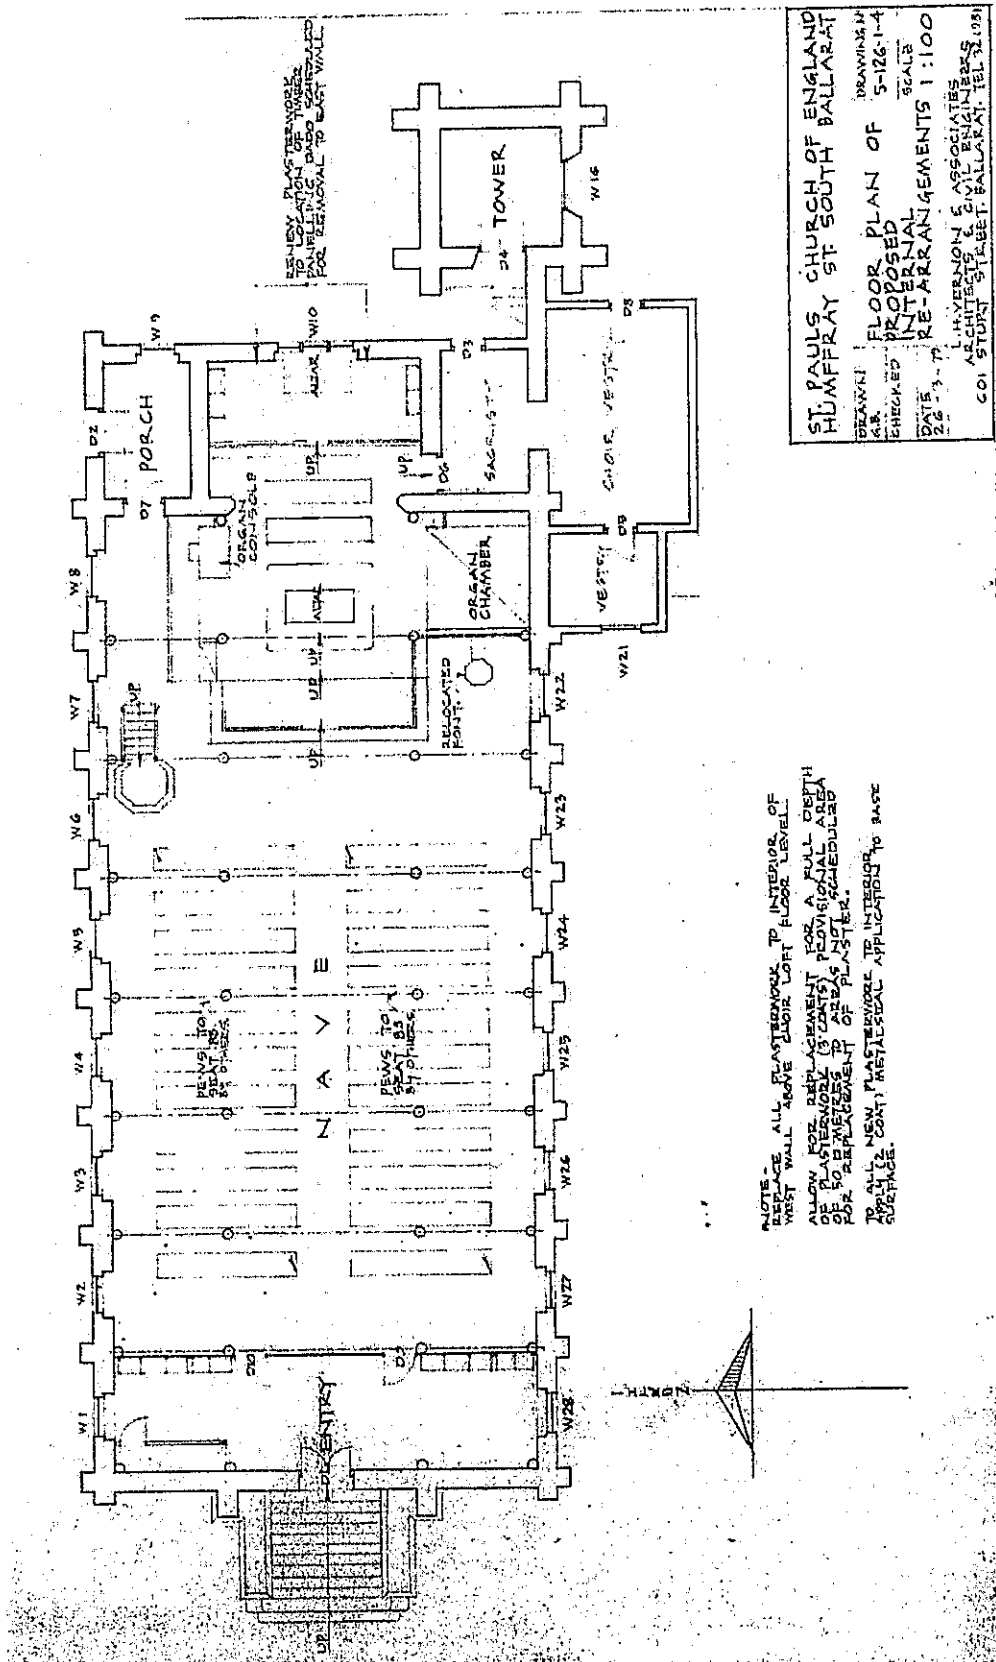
St. Paul's Church, floor plan of proposed internal arrangements by L.H. Vernon & Associates, 26 March 1979. Source: St. Paul's Anglican Church.
